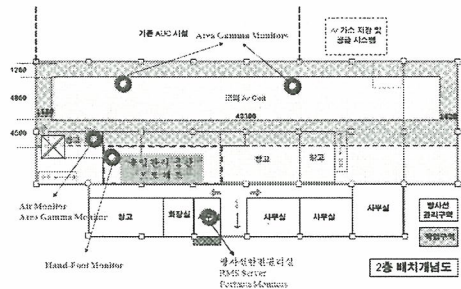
Detector Locations in the Second Floor of the PRIDE Facility.
